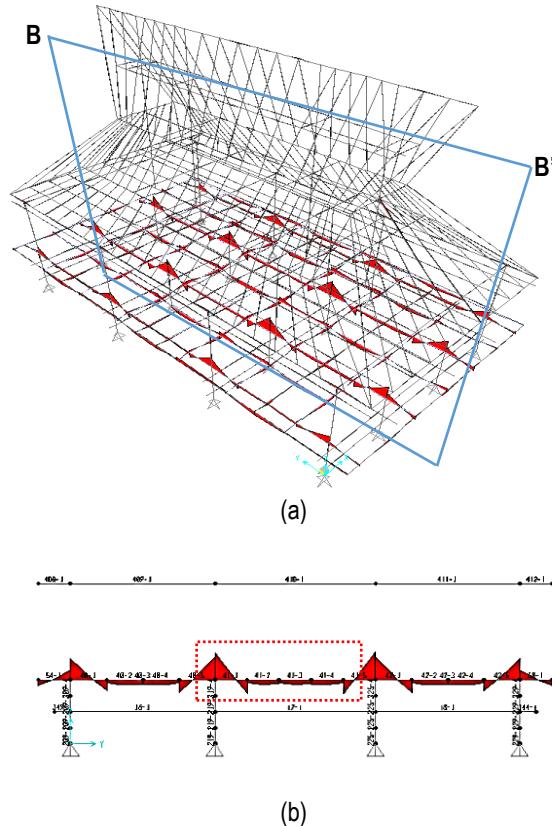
Axonometry drawing (a), and section B-B' drawing.
